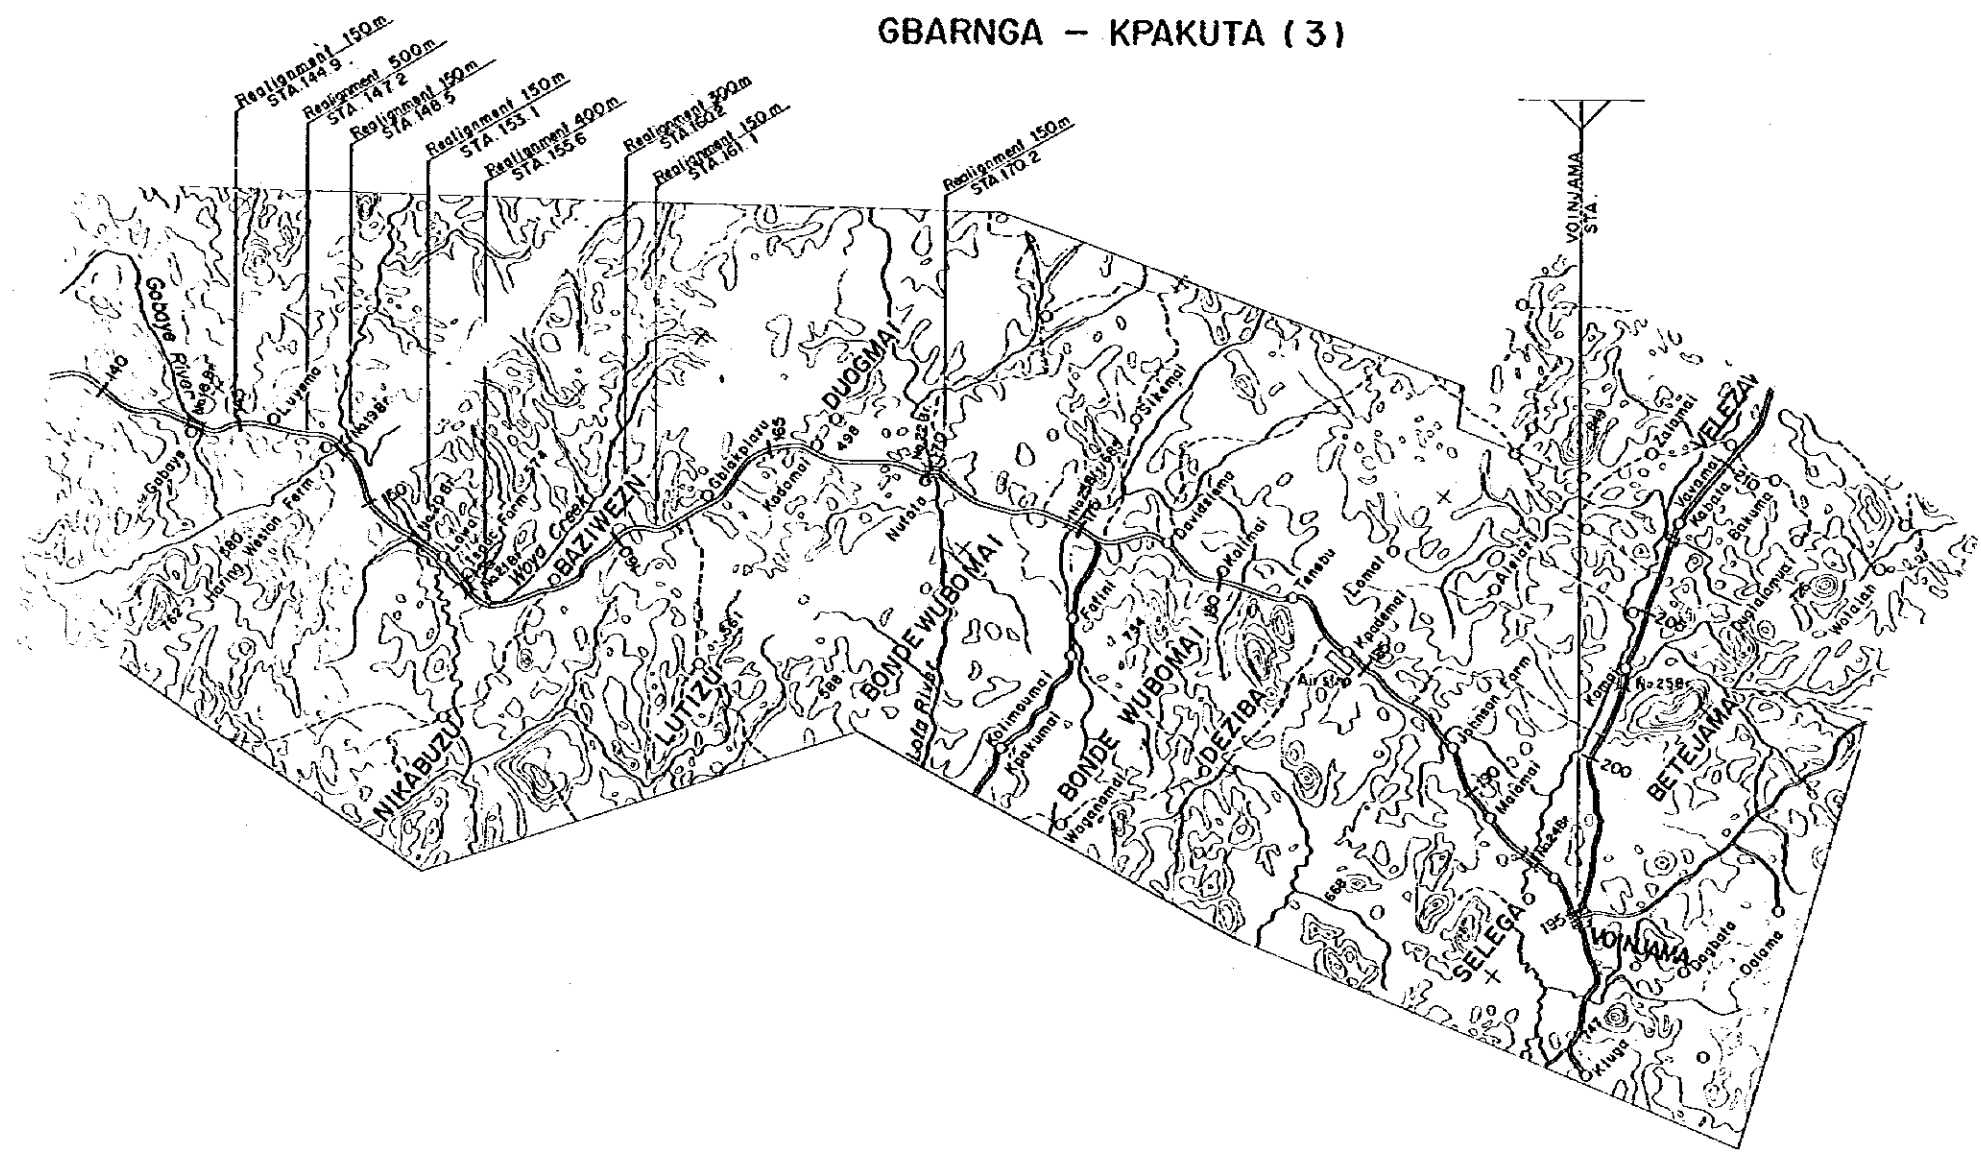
(3) ROAD PLAN AND PROFILE
